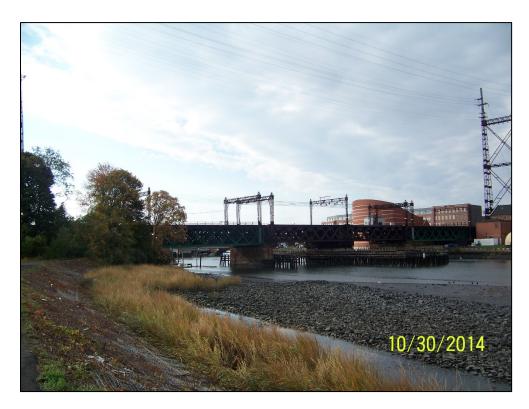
View of the upstream side of Walk Bridge looking southwest.
